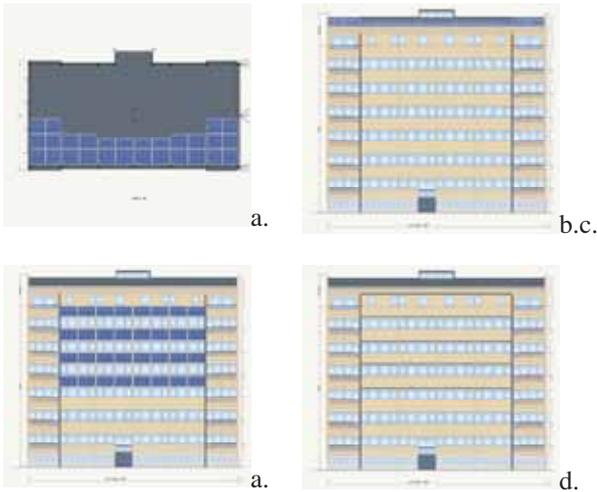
Figure XV.xiv - Design variants: a. I Design Variant: roof 40° (roof and facade layouts), b. II Design Variant: parapet 90°, c. III Design Variant: parapet 45°, d. IV Design Variant: sun shading 0°
